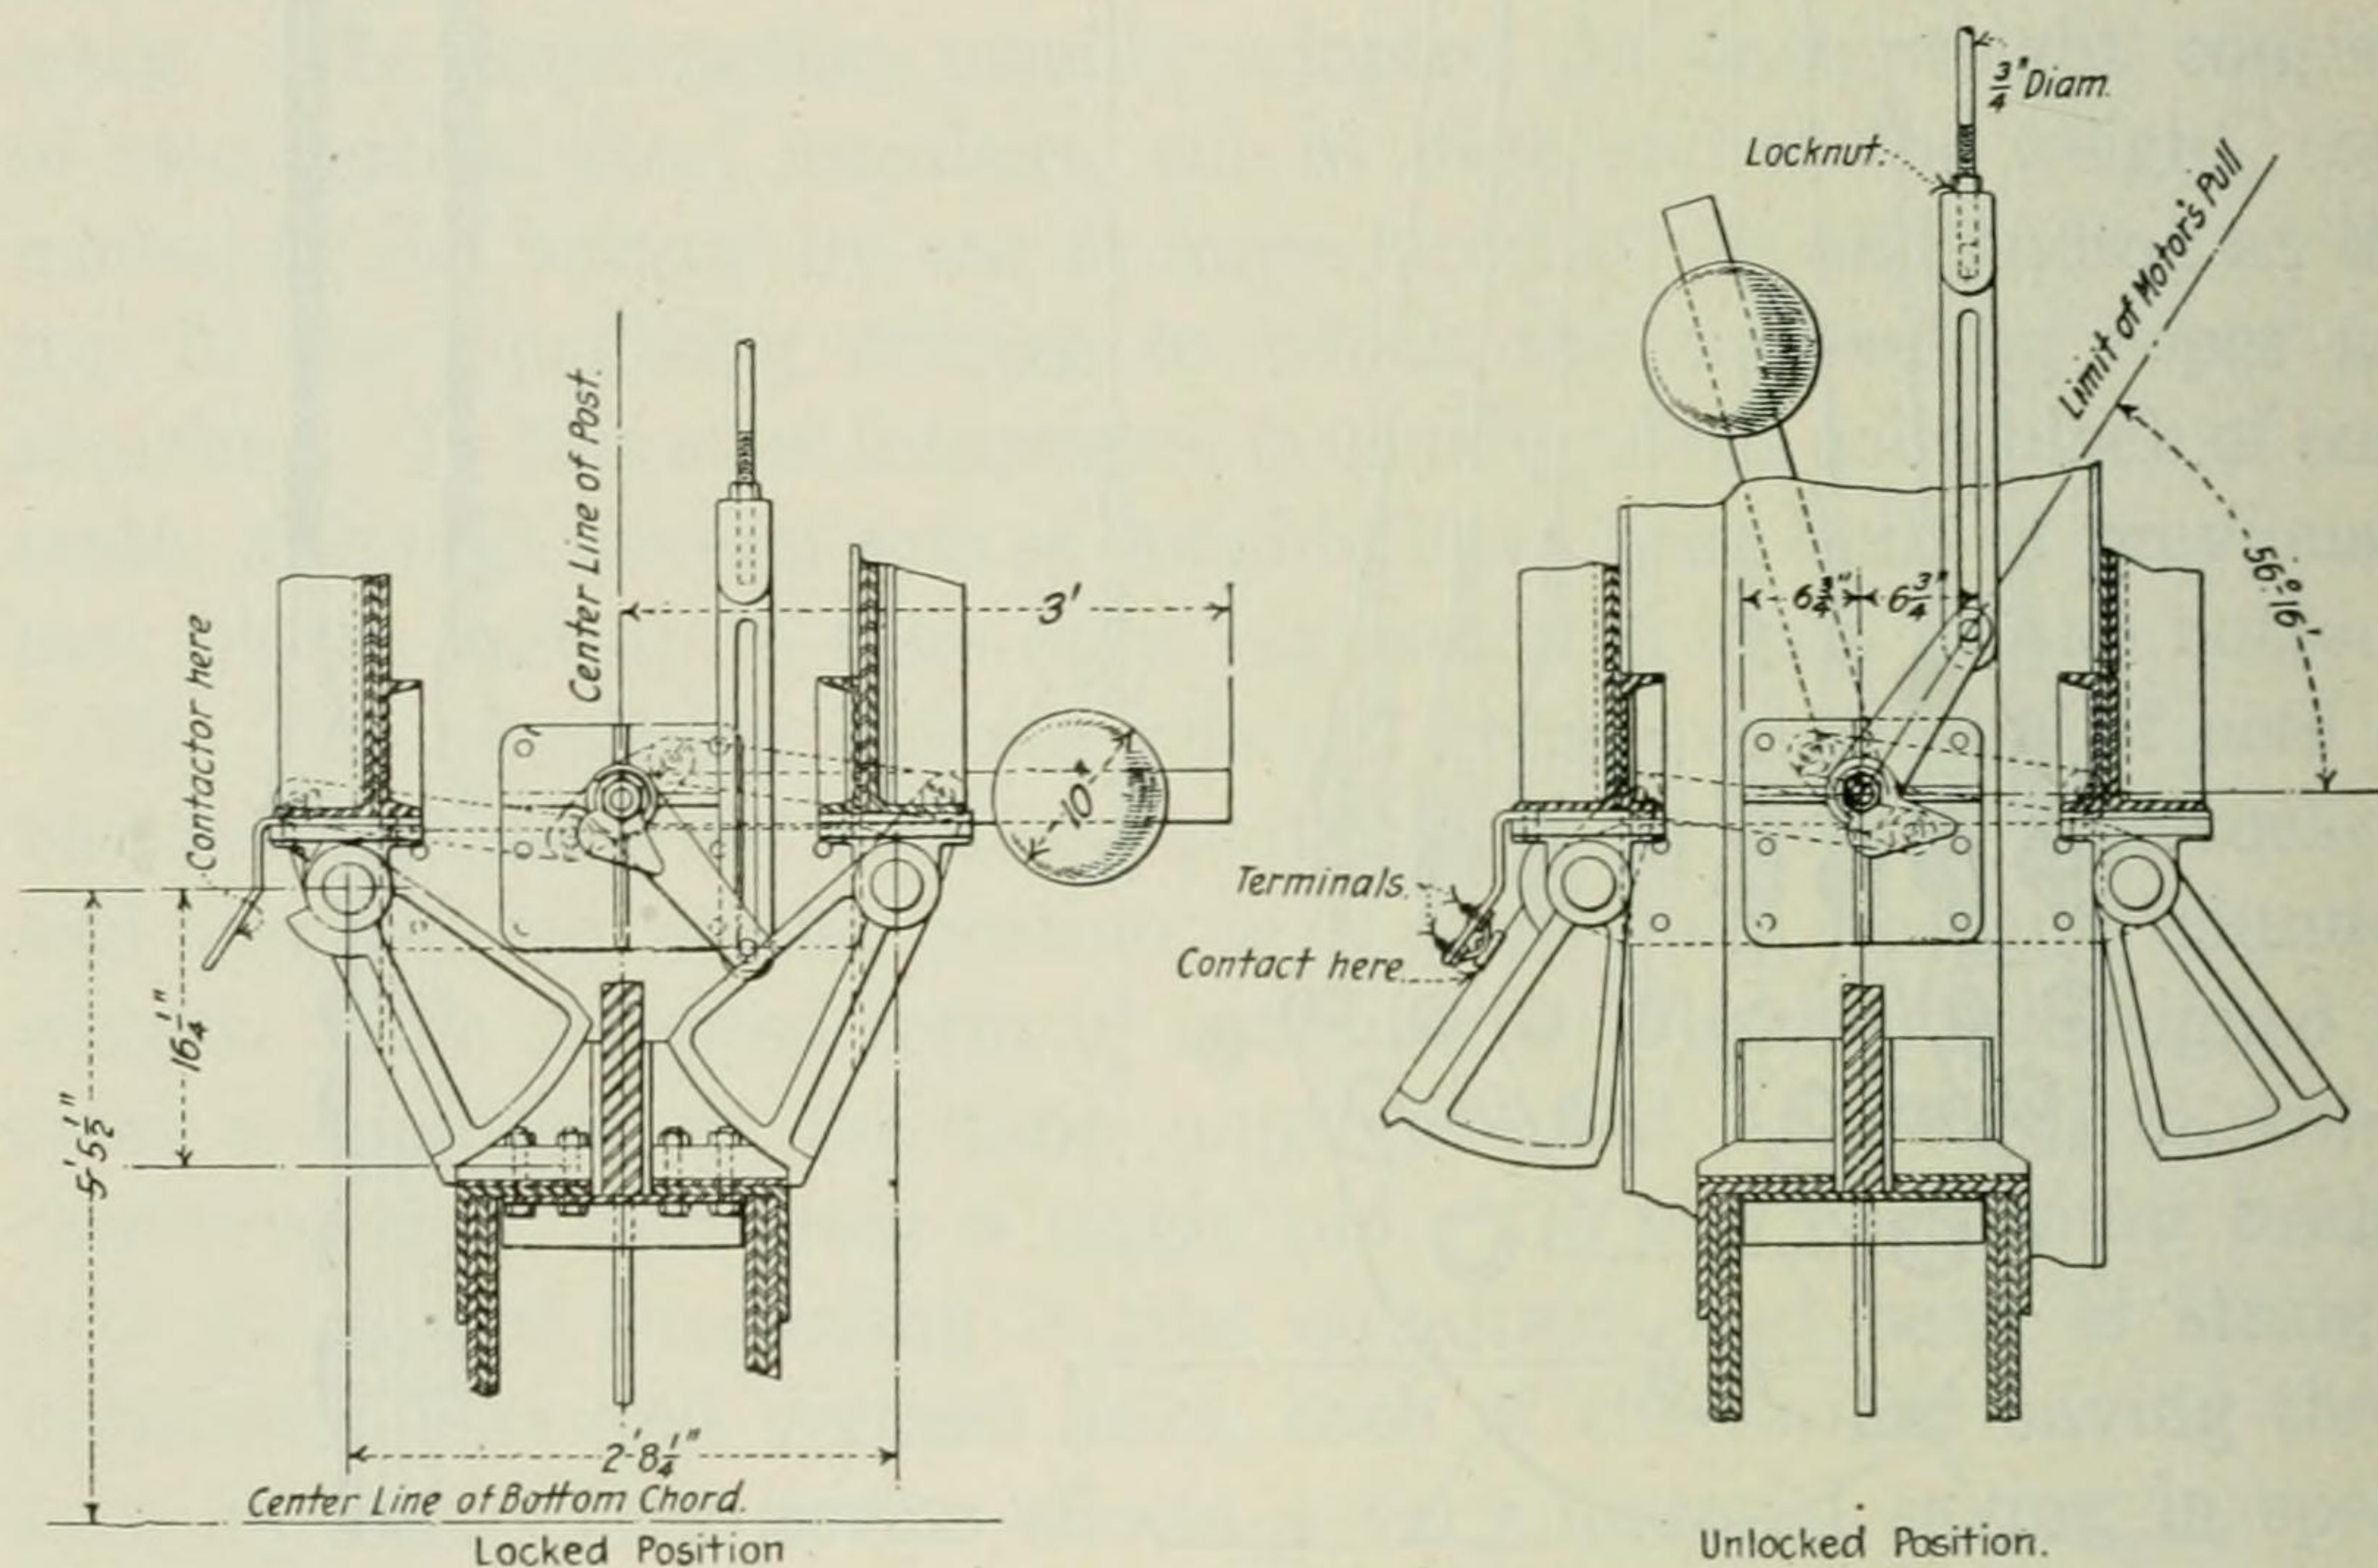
LOWER-DECK AUTOMATIC CAM LOCK, WILLAMETTE RIVER BRIDGE, OREGON-WASHINGTON RAILROAD AND NAVIGATION CO.
